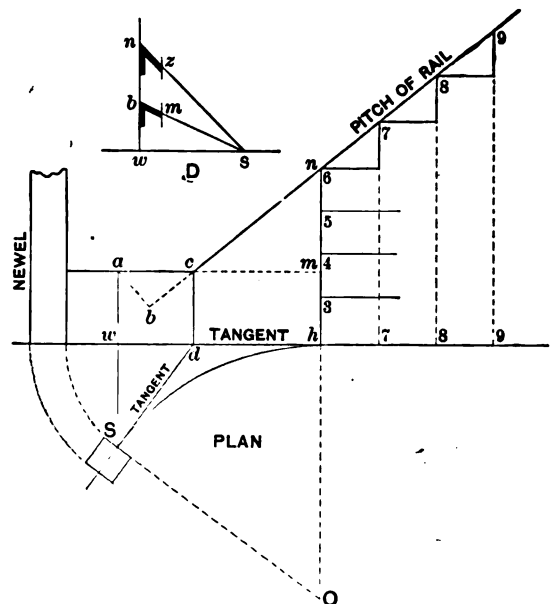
Plan and Elevation of the Stretchout Curve and Tangents.
